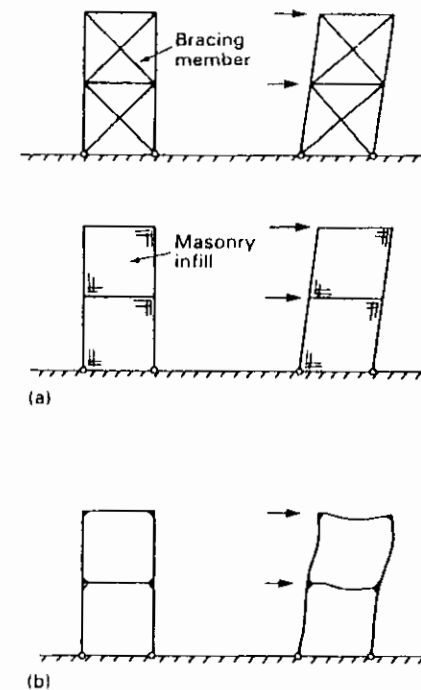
Basic methods of providing sway resistance in a steel frame: (a) bracing in simple construction; (b) rigid-frame action in continuous construction.
